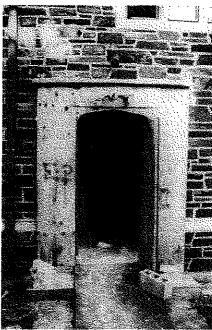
A contractor's solution to protecting the limestone door surround consisted of thin foam sheeting, secured with wood nailed to the masonry. This protection was rejected as inadequate by the architect, and a full plywood enclosure constructed. In the architect's solution, it should be noted that a temporary door is used while the original door is stored for safe keeping during construction. Photo: Ford Farewell Mills and Gatsch Architects.
